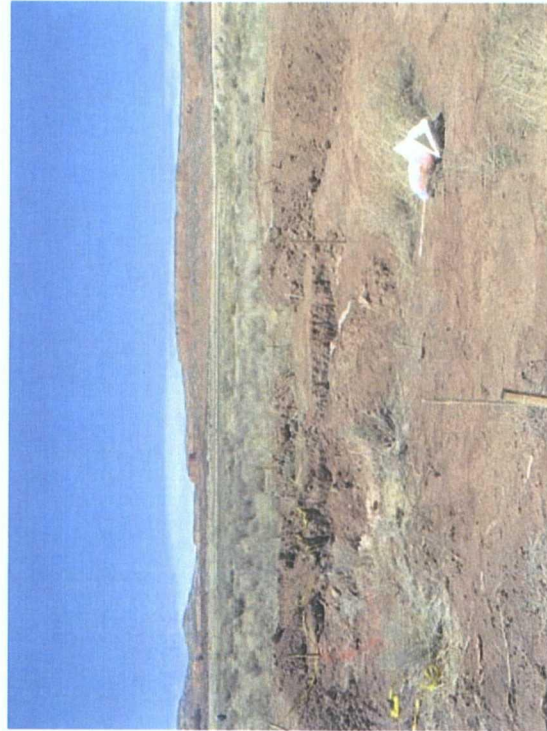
Looking North, additional excavation area 7' and extended 3' areas are marked
